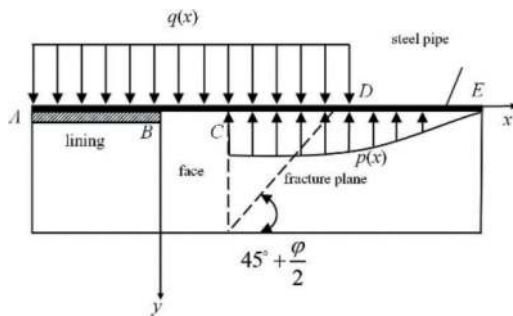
Pasternak-based two-parameter elastic foundation beam tunnel construction pipe-roof force calculation diagram.
